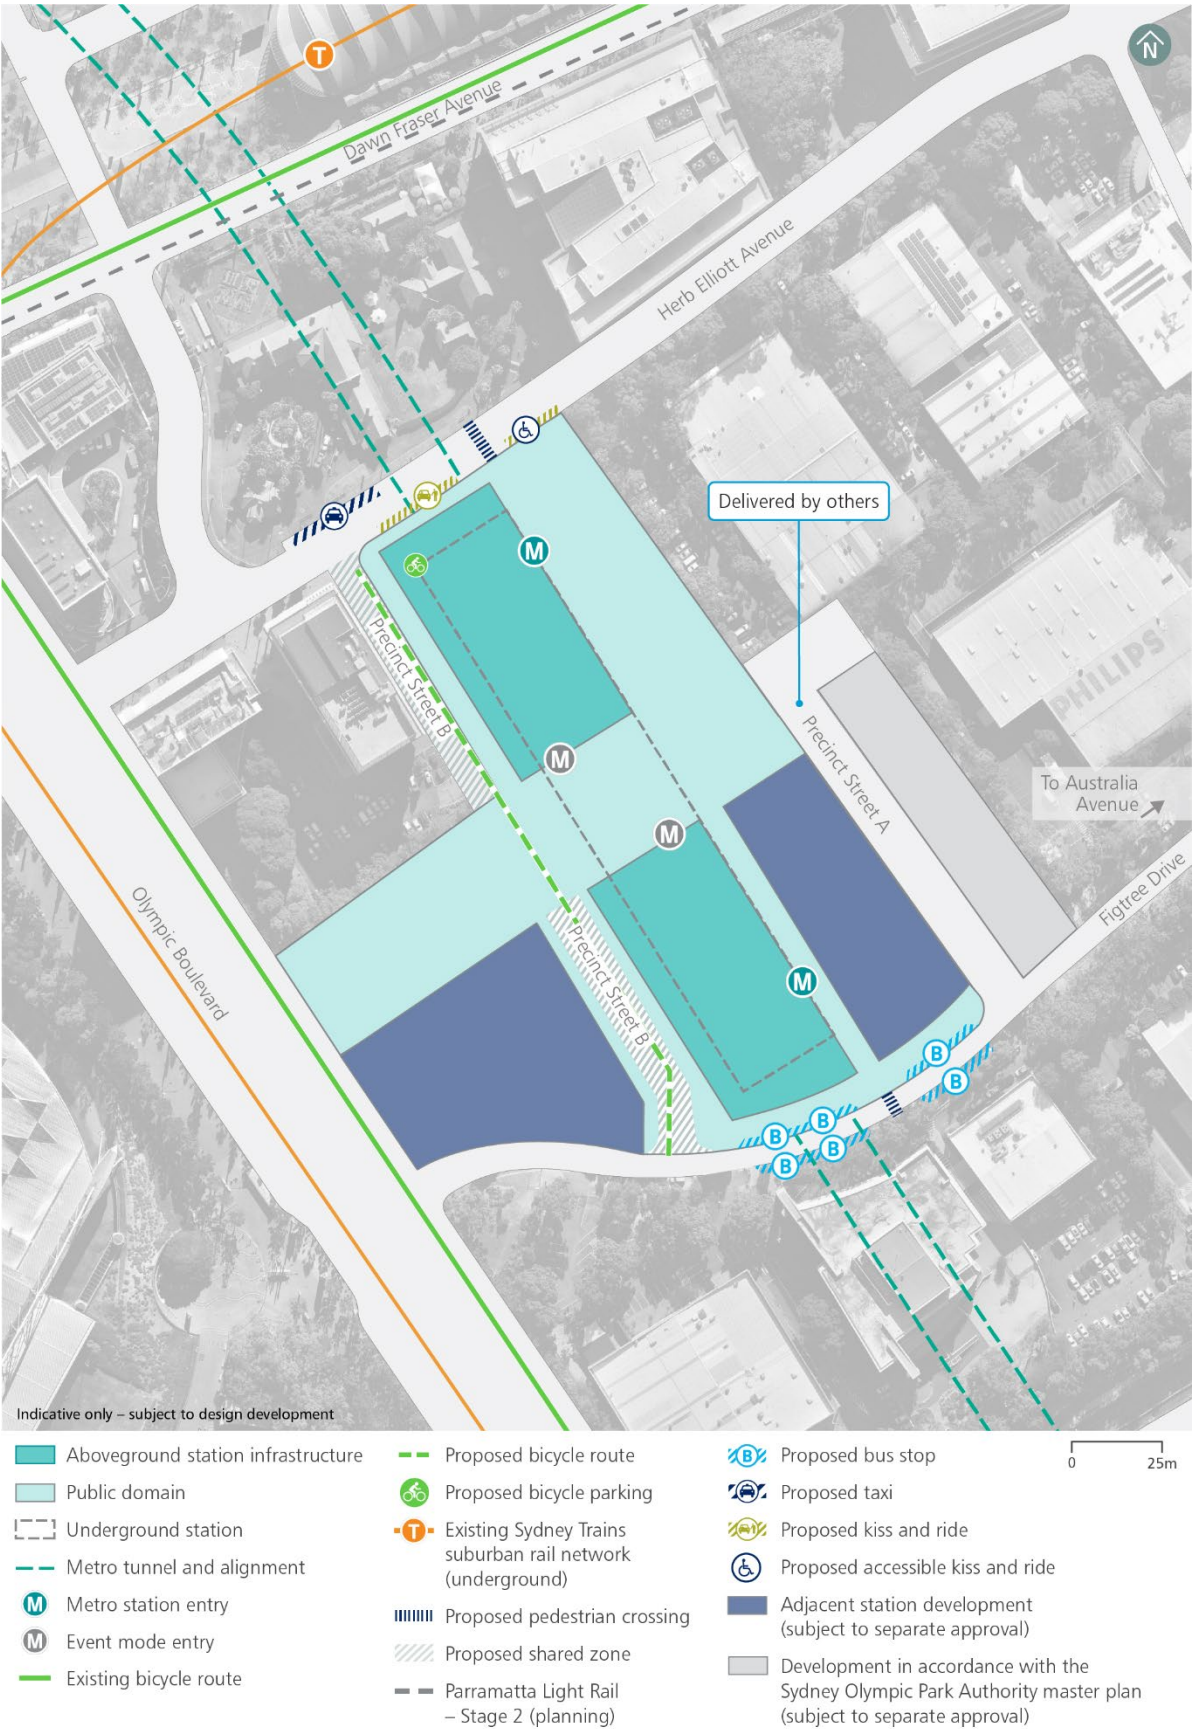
Indicative layout and key design elements – Sydney Olympic Park metro station
